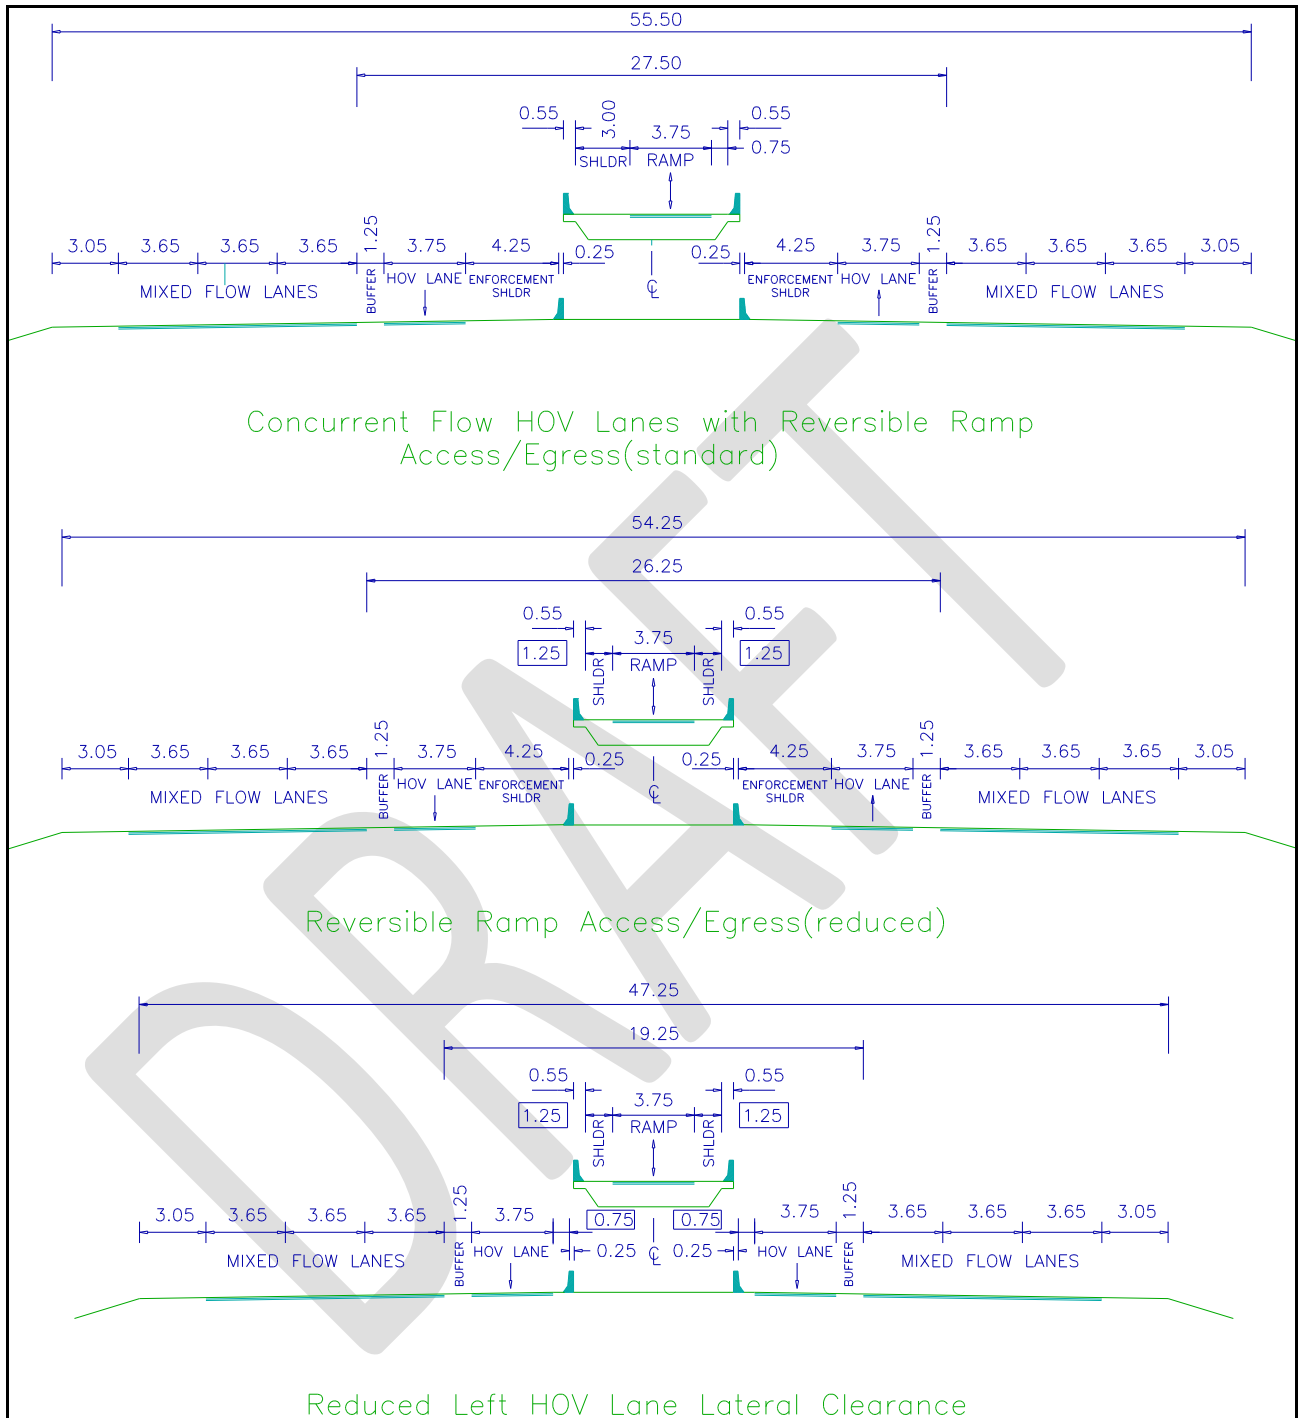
Median HOV Reversible Ramp Cross-Sections
